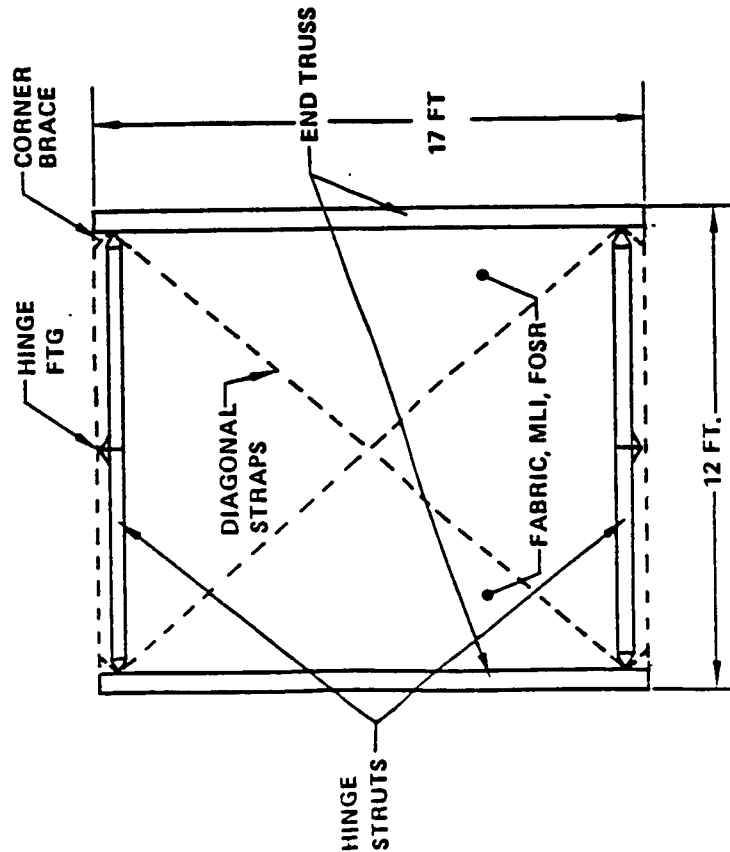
Wall/Door Typical Panel Section (12 Ft. x 17 Ft.)
